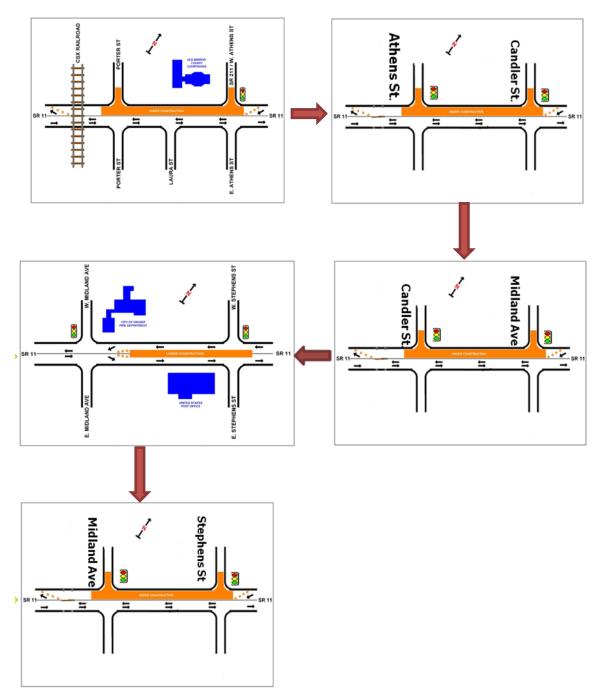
Diagram. Typical work plan for west and center lane panel installation.
